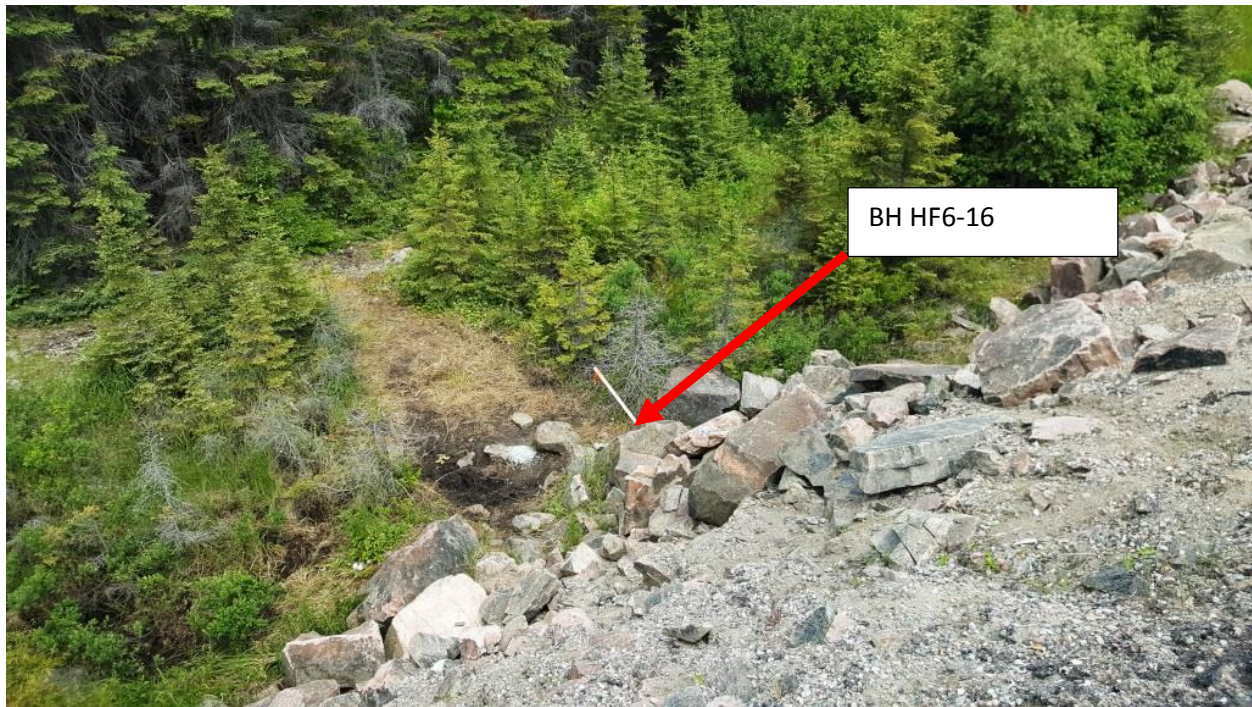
Looking toward north - BH HF6-16 (June 2017)
